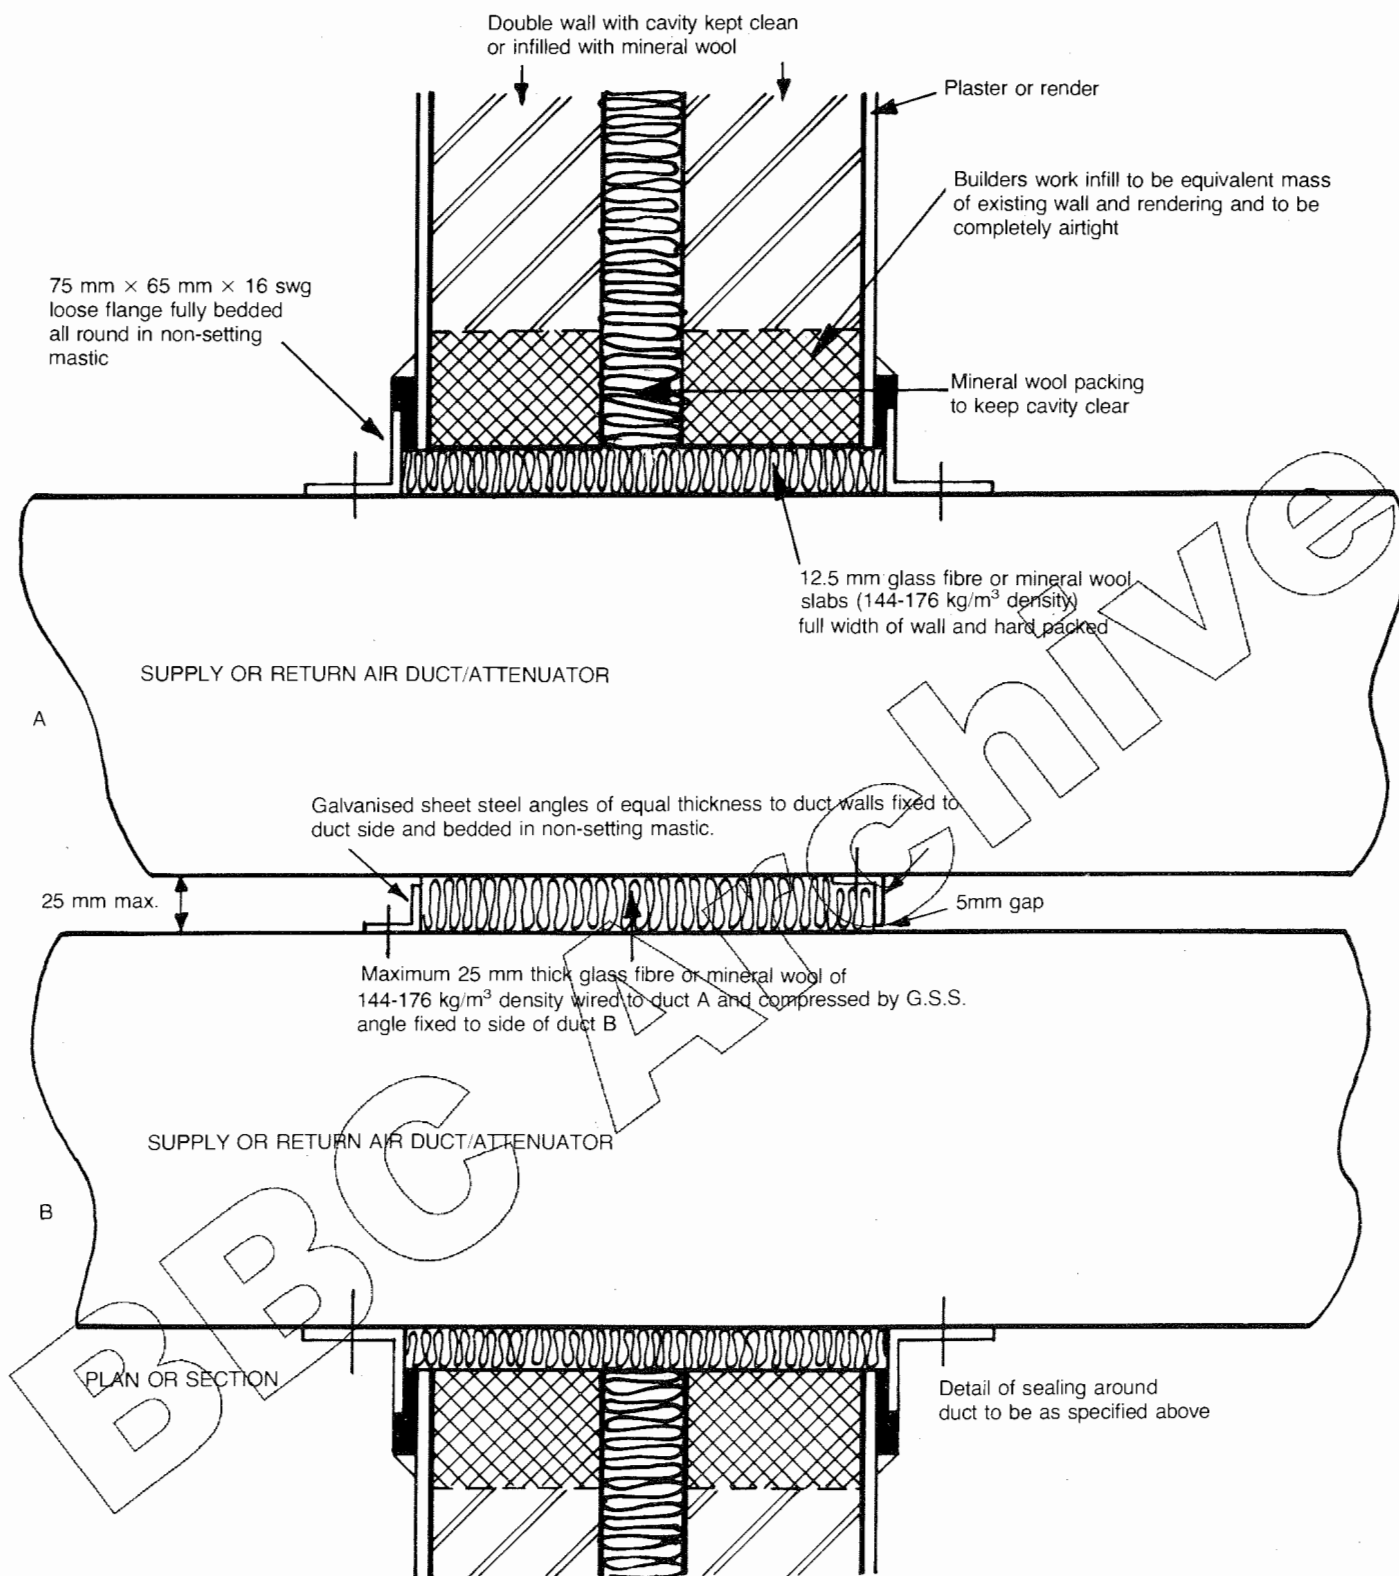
Typical detail for sealing around ventilation ducts where they pass through building structures
